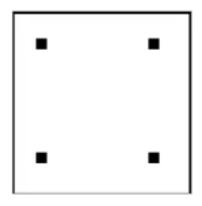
Sketch showing the Space frame supported by four intermediate columns ¹²⁷
